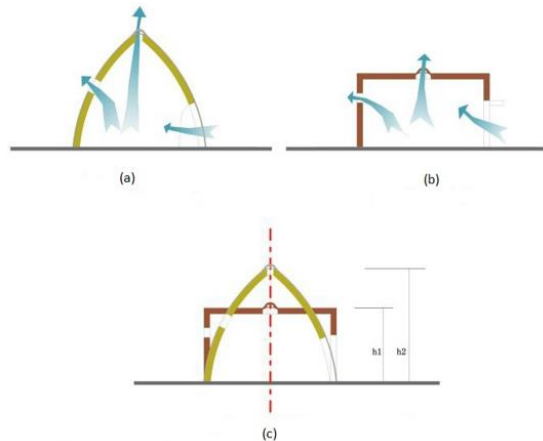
(a) Dome roof ventilation (b) Flat roof ventilation (c) The different height from roof windows to floor with the same inner wall length
